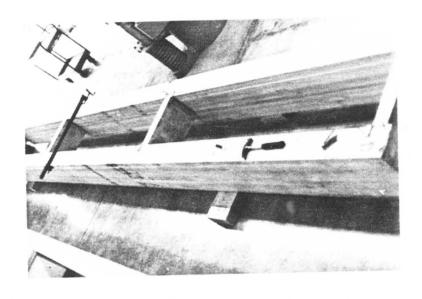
Construction Details of 6-3/4" by 16-1/2" Glulam Beam Test Specimens.
